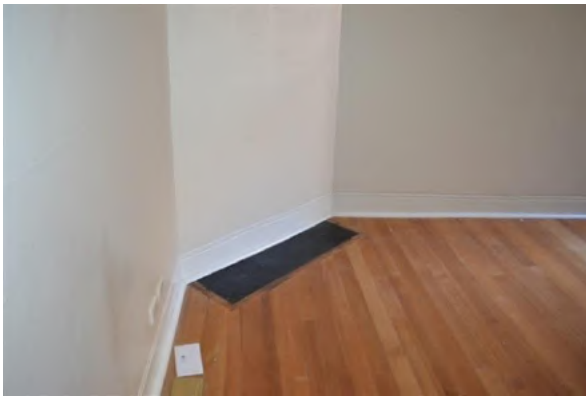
The original corner fireplace with concrete hearth is blocked in the living room (space G.3)—50 / 46–56 Gloucester Street. (Source: GML Heritage, June 2016)
